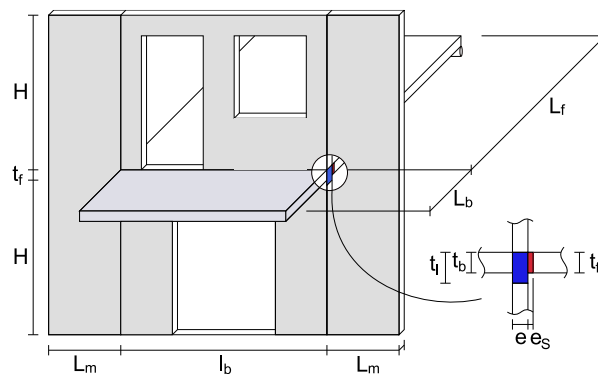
General structure of balcony-lintel-walls-floor-thermal break.
